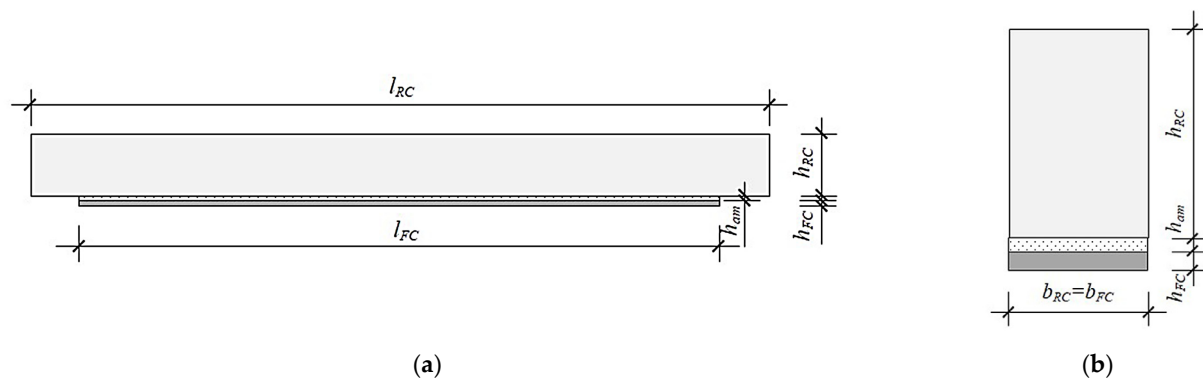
The strengthening methodology of RC beams with ferrocement elements: (a) longitudinal section; (b) cross-section.
